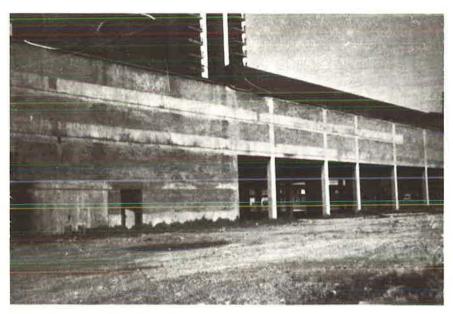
Outer Drive East Apartments; detail of foundation. (June 1971 photo by Marshall and Stevens, Inc.)
